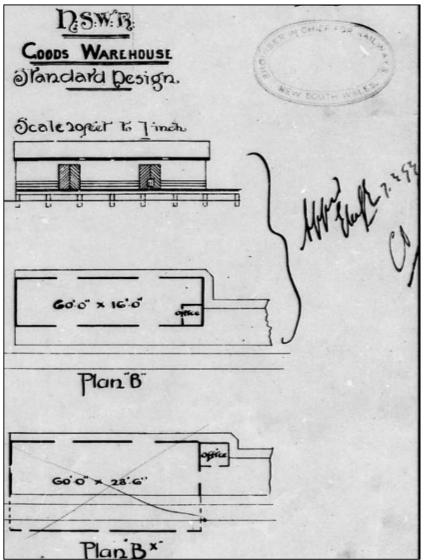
Plan and elevation of the Goods Warehouse. ARHSnsw
